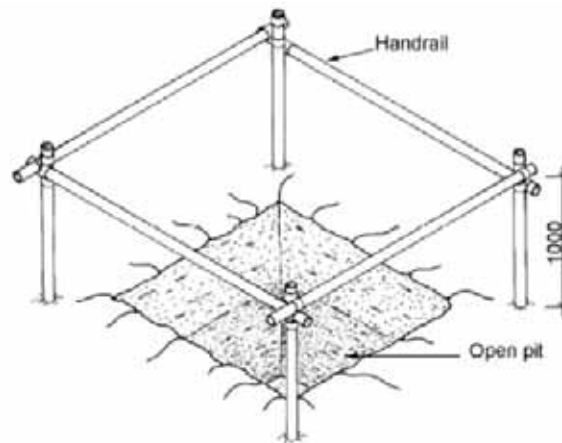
Opening in edge protection (picture from TAFE NSW Construction & Transport Division limited height scaffold report)
